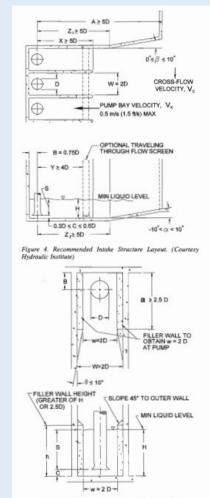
Filler Wall Details for Proper Bay Width. (Courtesy Hydraulic Institute)
